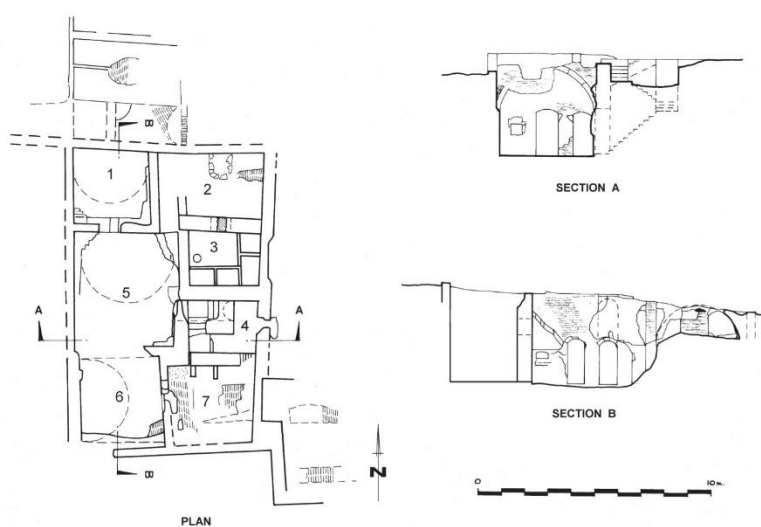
Plan and section of House 5, Area A/9, of Kellis (Hope 2003: 235, figure 8) Room 5 provided access to all the other rooms indicated on the plan.
